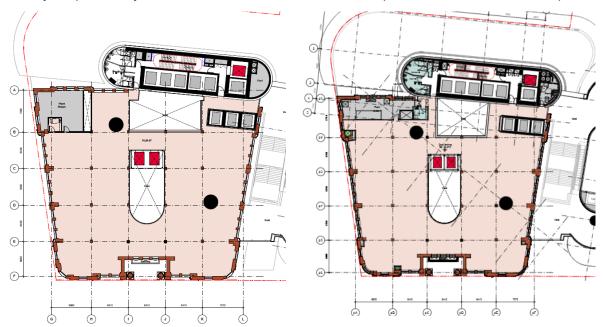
General Arrangement Plan, Level 02, Drawing no. 10L02000
